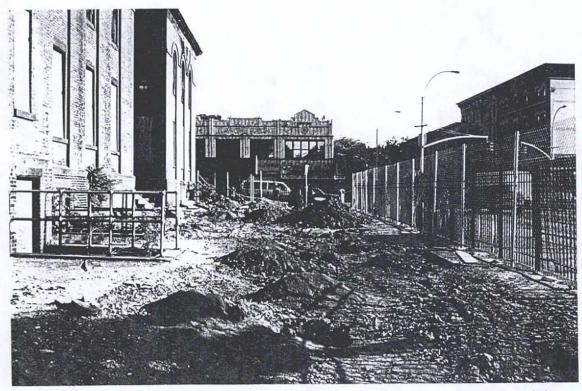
Photograph A: P.S. 90/Beth Rivka School. Facing southwest from corner of Bedford Avenue and Church Avenue.
